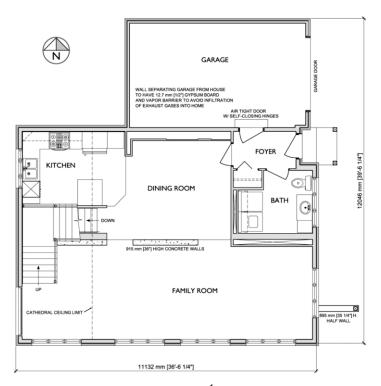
First floor plan of ÉcoTerra (CMHC, 2007)
